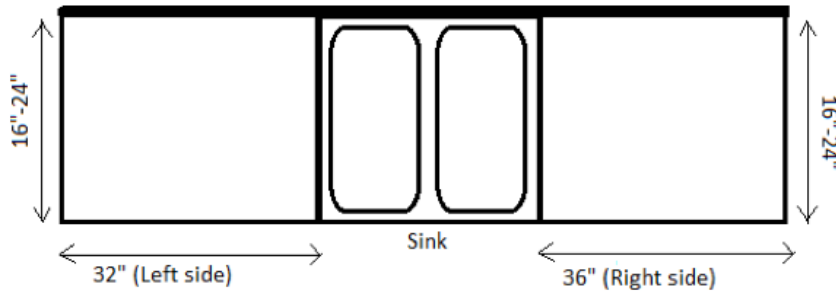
Typical Minimum Dimensions for Counter Adjacent to Sink
